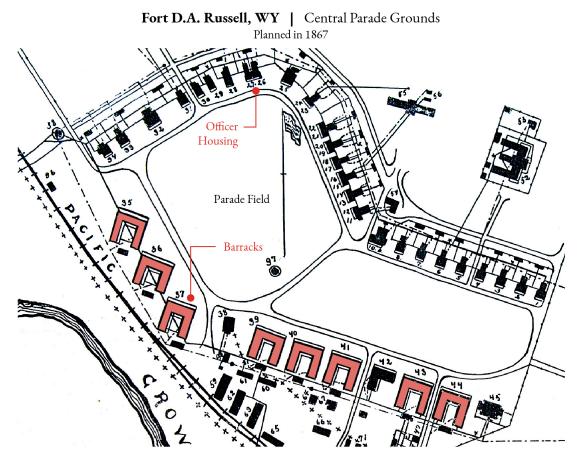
1898 Plan of Fort D.A. Russell. Showing the layout of the garrison, with enlisted barracks and officer housing framing the central parade grounds. Plan courtesy of the US Air Force. Graphic created by the author.
